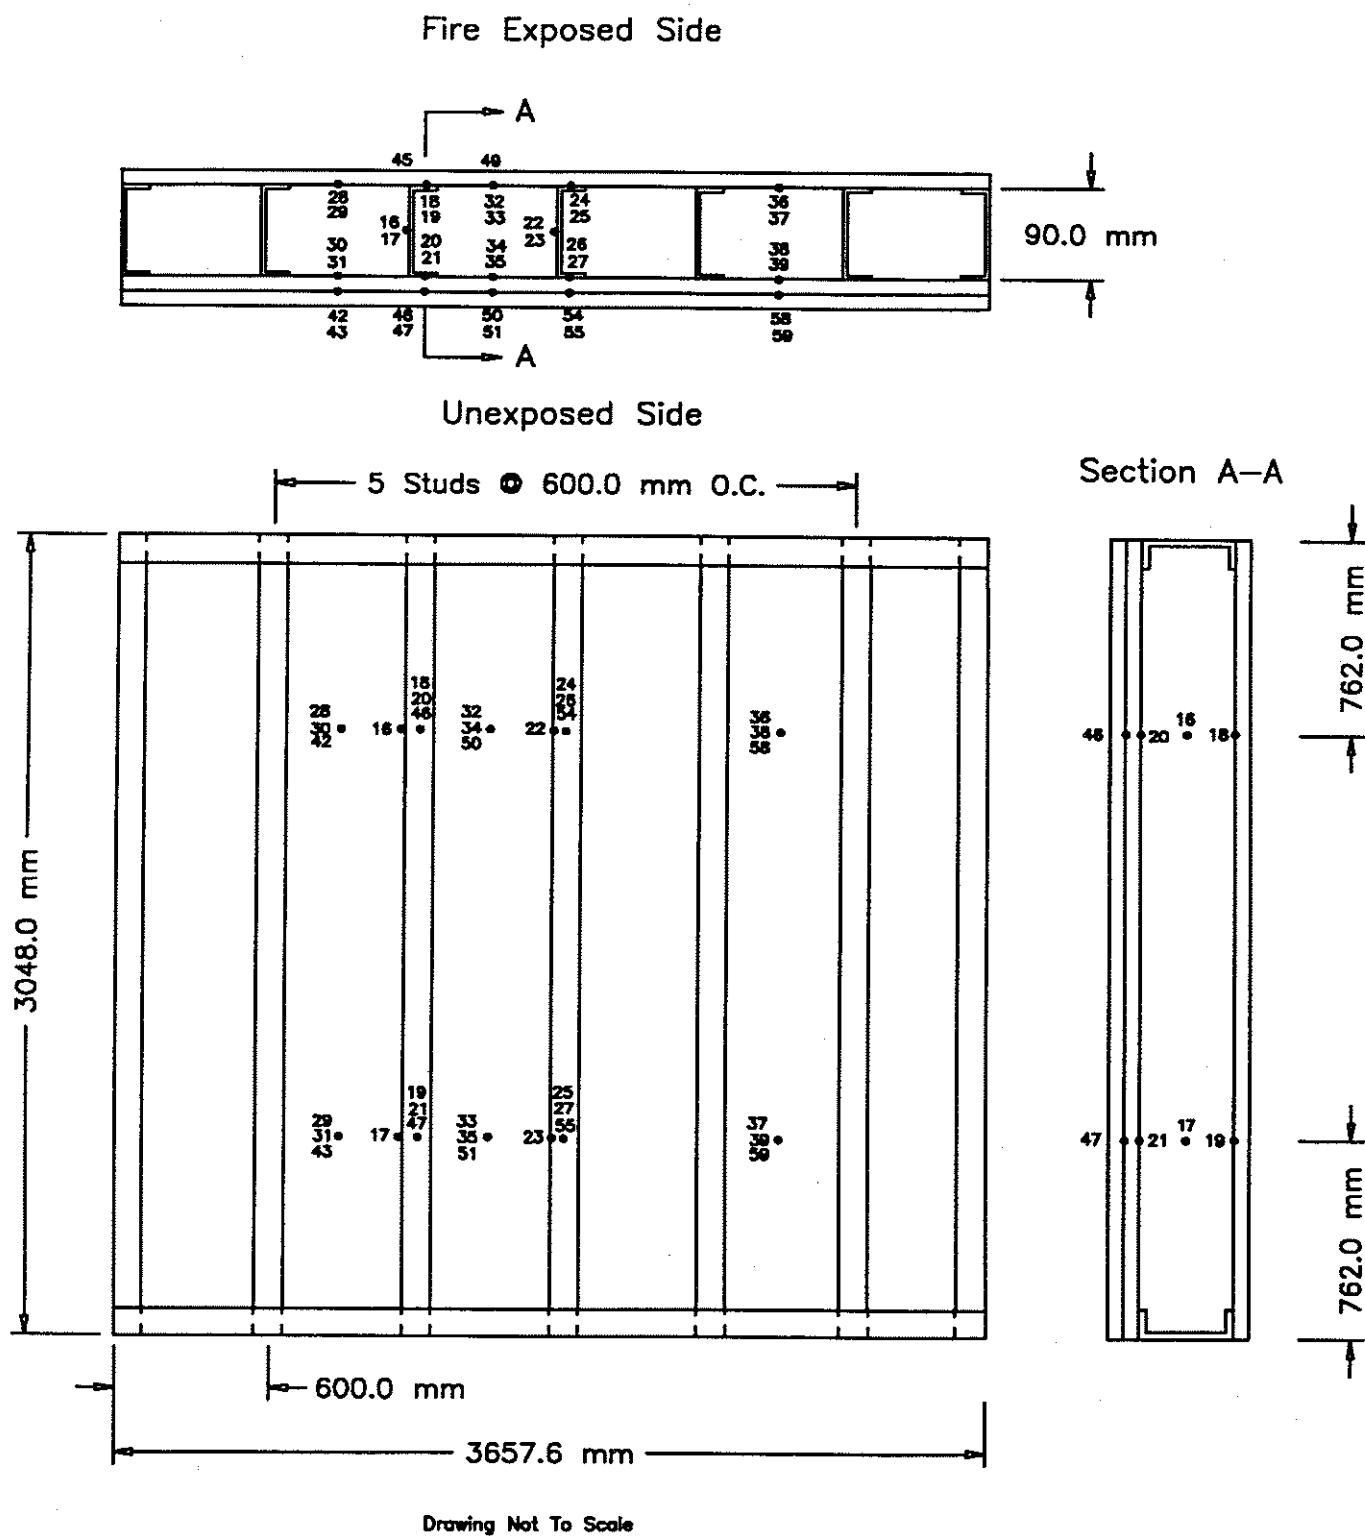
Thermocouple Locations in Full-Scale Test S-07
